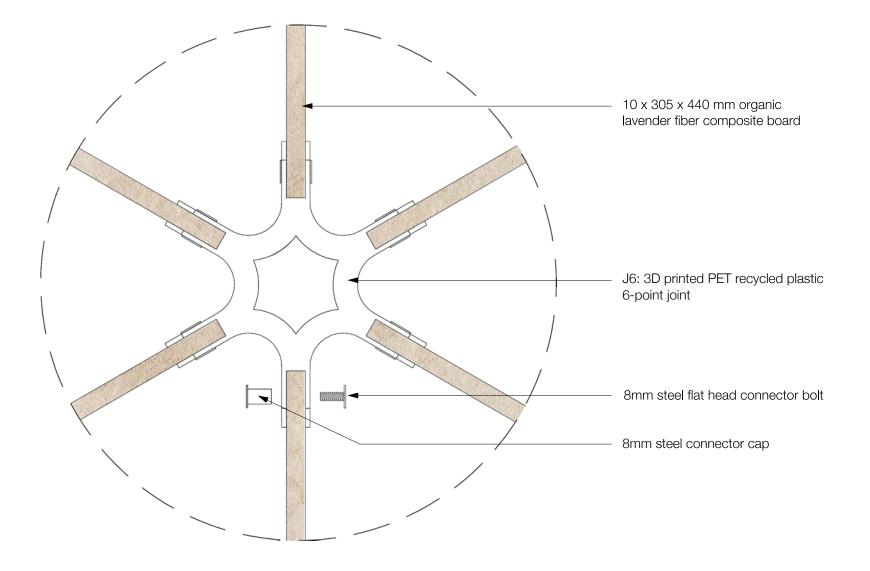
Detail 1: Front Elevation (Author, 2016).
